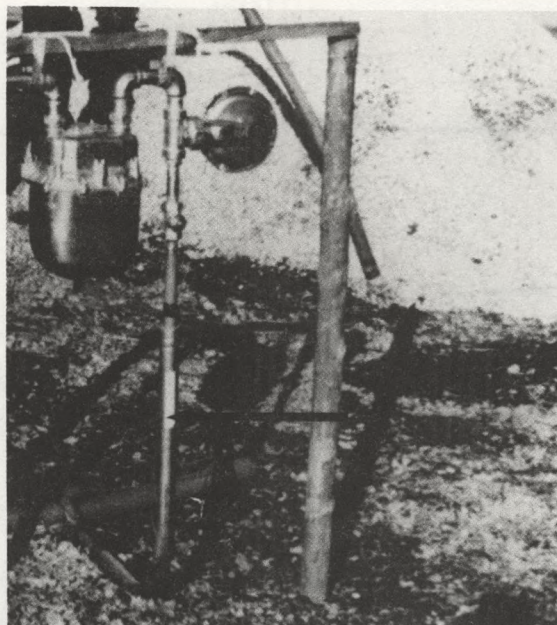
is an example of an anodeless service riser off a PE main. There are many different manufacturers of anodeless risers. The primary advantage of an anodeless riser is that it does not have to be cathodically protected because the outside steel casing is not the gas carrier. The plastic inside the steel casing is the gas carrier. If you purchase anodeless risers, make sure that they meet all DOT requirements. If you install steel risers connected to plastic pipe by a transition fitting, make sure that you coat the steel riser and cathodically protect it.
